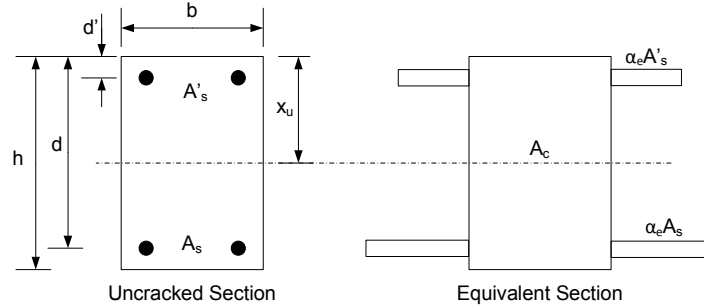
The Uncracked Reinforced Concrete Section (Kong and Evans, 1987).
